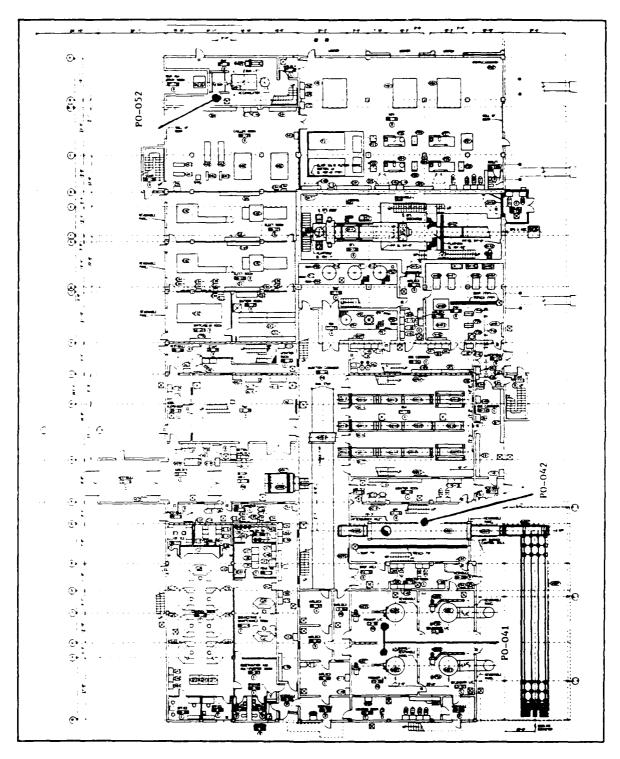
TEAD MDB First Floor Plan (Scenarios PO-041, PO-042 and PO-052)
